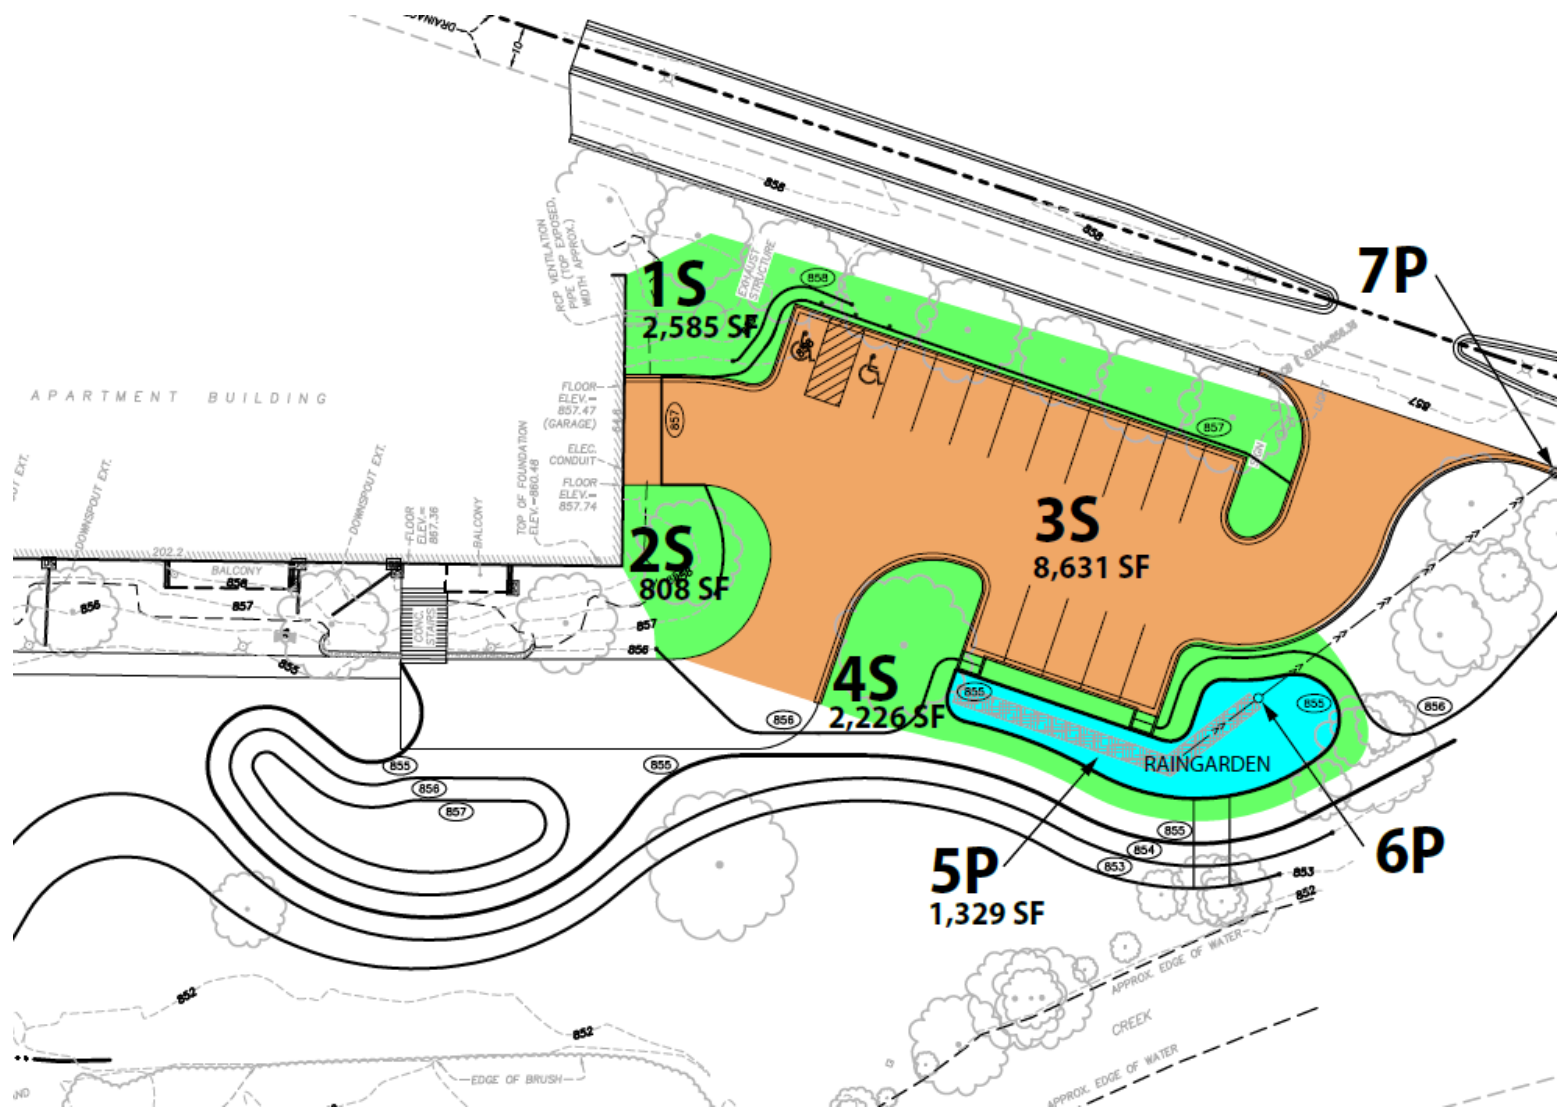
The existing parking lot will be removed and a new parking lot will be constructed closer to Bass Lake Road. Runoff is directed to the new rain garden with a TDA underdrain system.
